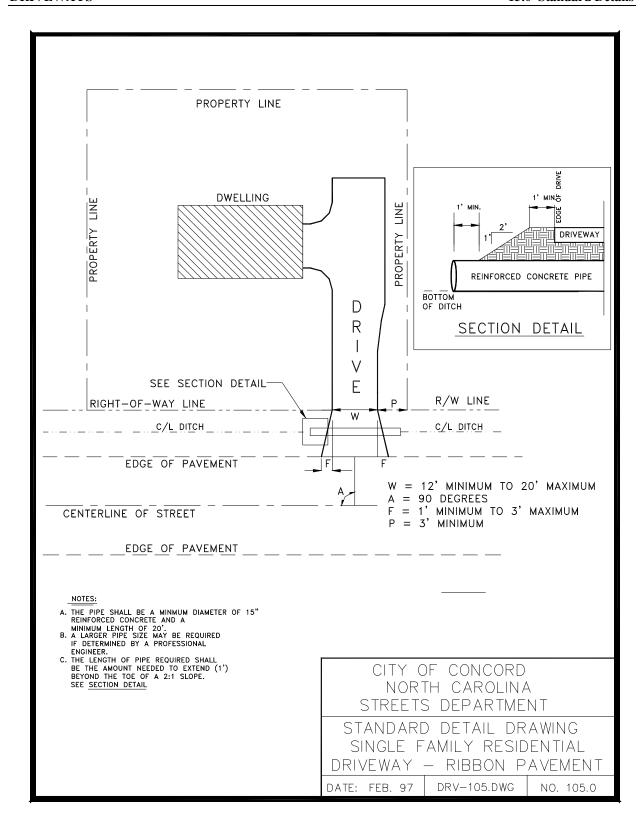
Single-Family Residential Driveway with Ribbon Pavement Street.
